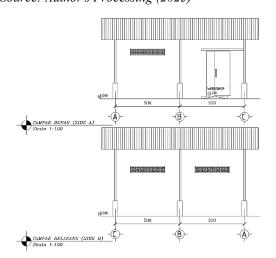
Front and Back View of Expansion Plan Source: Author's Processing (2025)
